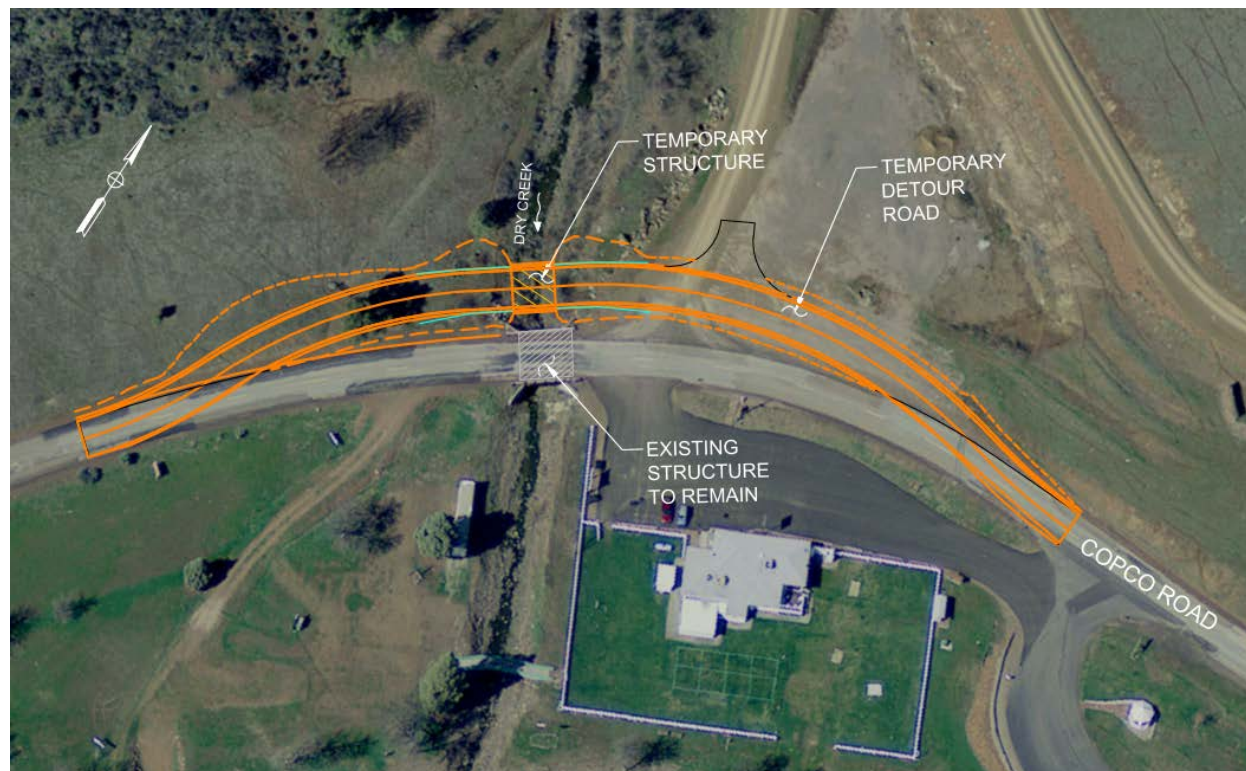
Copco Road Temporary Structure at Dry Creek
